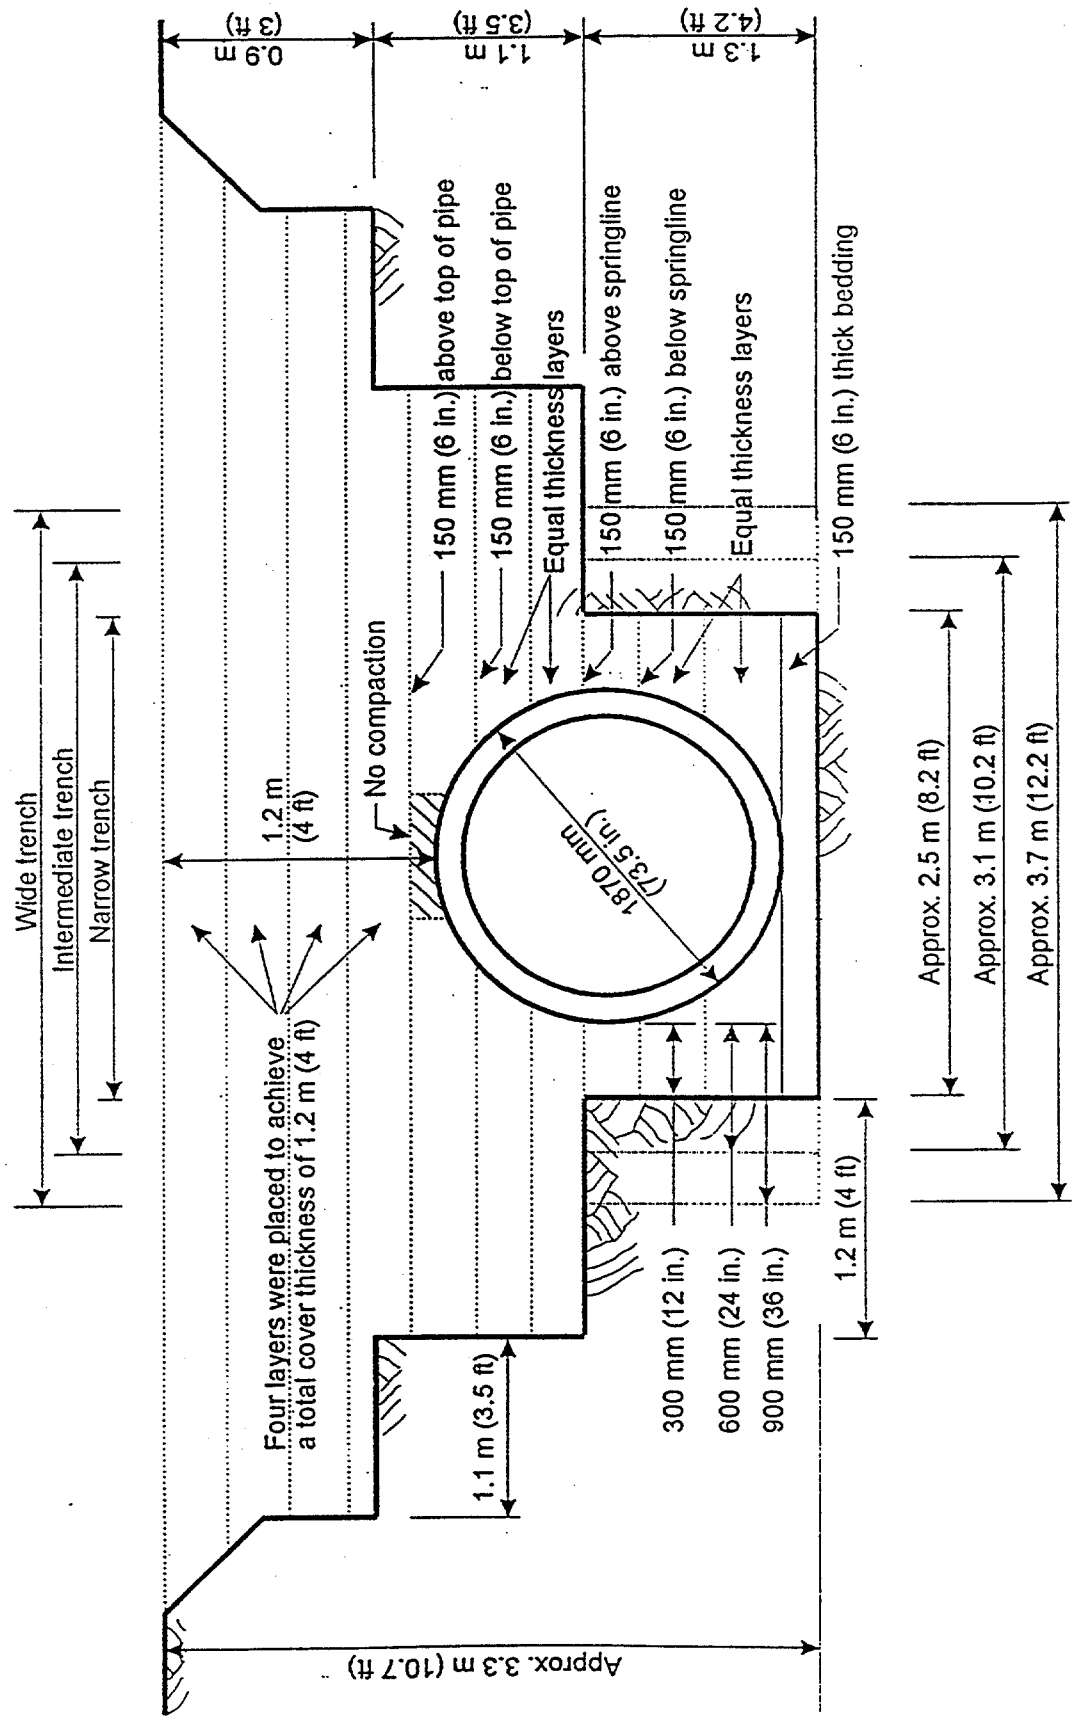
Typical Trench Cross-Section and Backfill Layer Thicknesses for 1,500 mm (60 in.) Diameter Concrete Pipe (Section for Plastic and Metal Pipe Similar)
